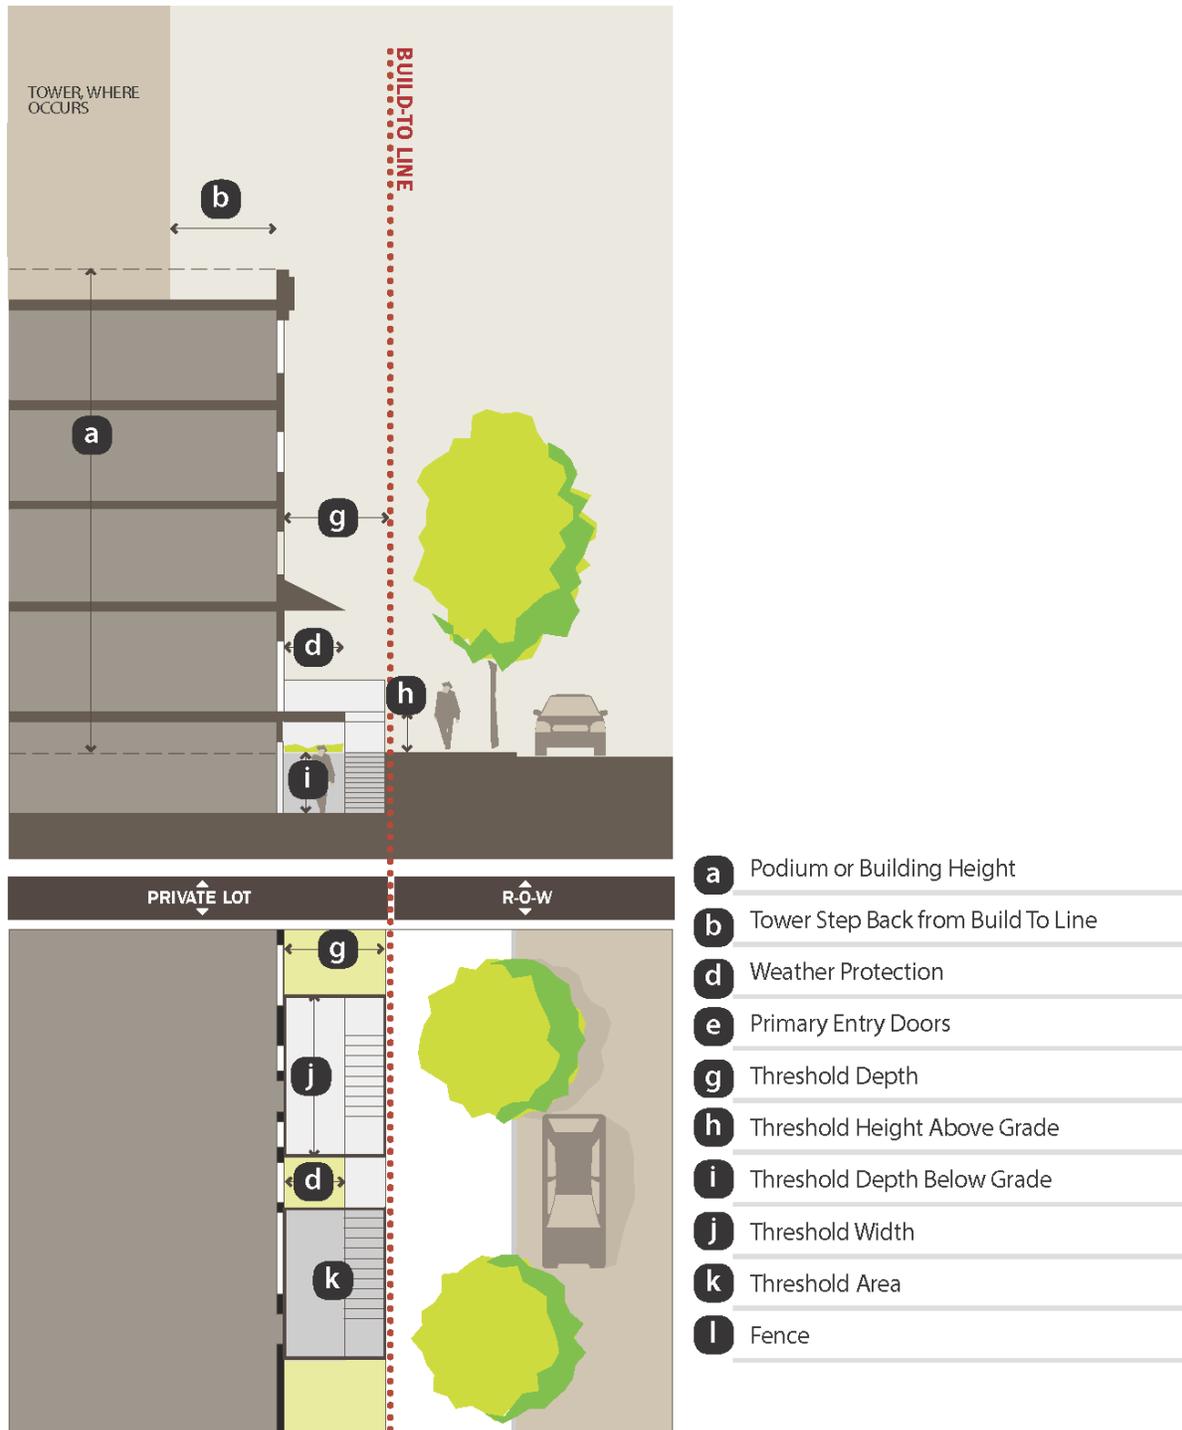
, Building Frontage – Porch-Stoop-Terrace
